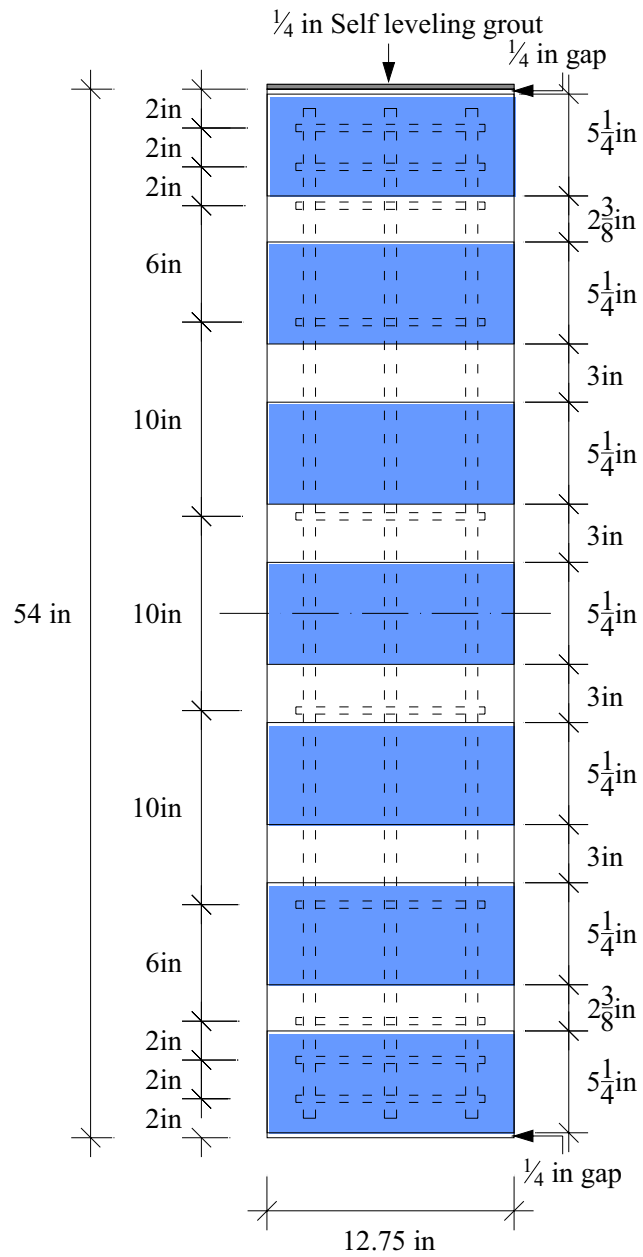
Longitudinal Cross Section; Wrapping Detail; Specimens F3
